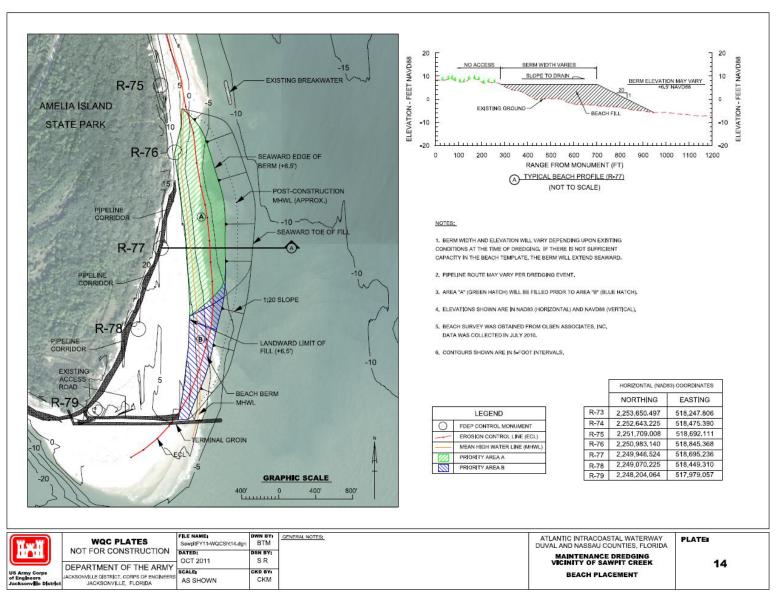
AIWW Sawpit dredging beach placement plan, 2011 permit.
